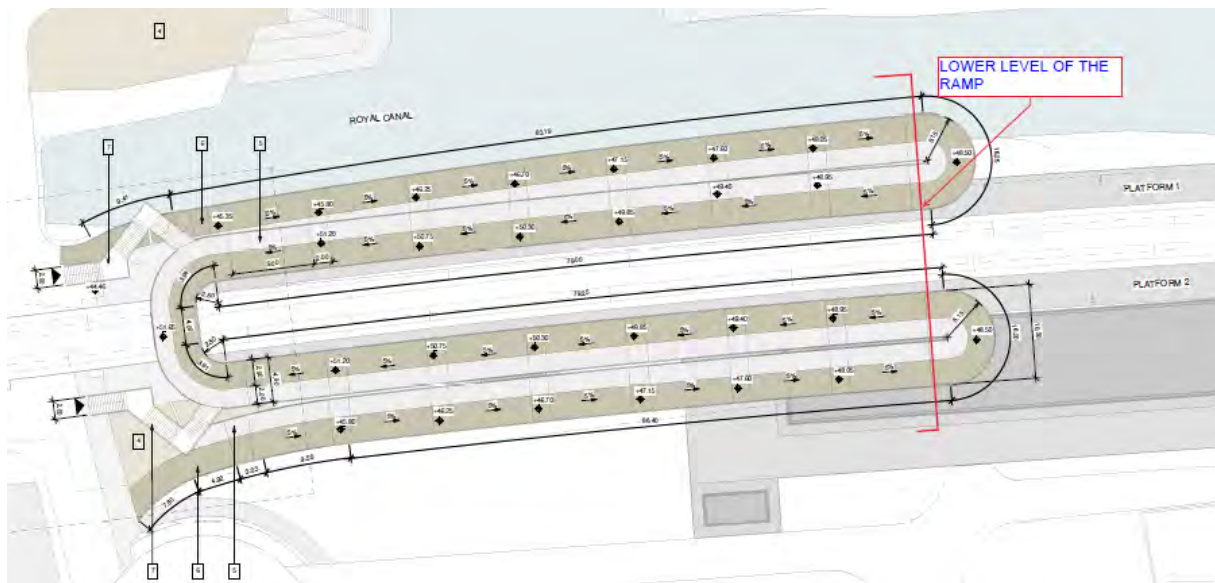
Plan of proposed Ashtown bridge with section mark
